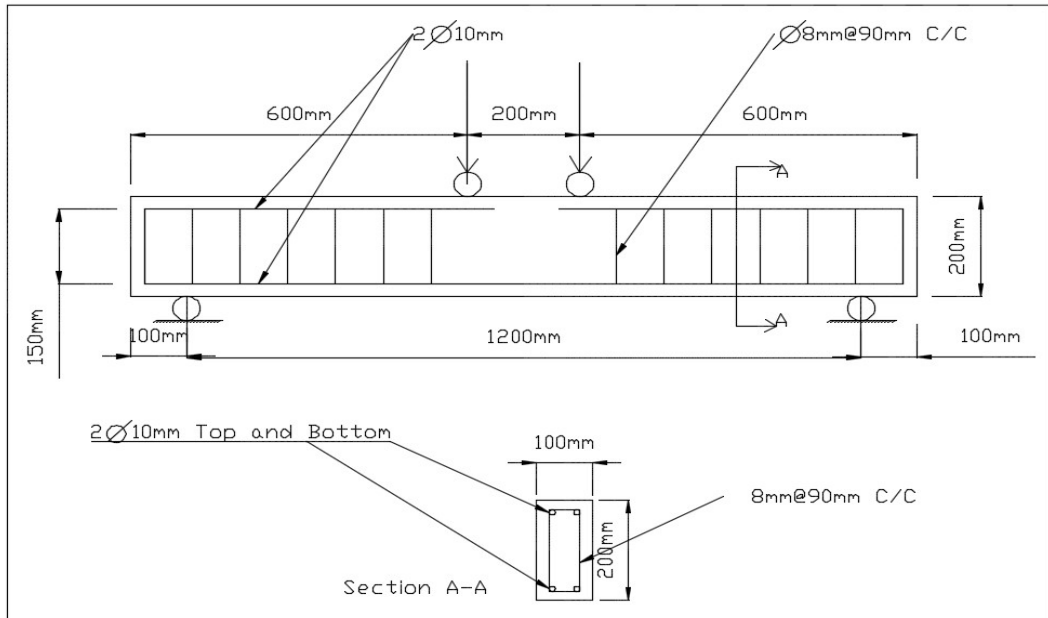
Schematic of four-point bending specimen configuration of control beams.
